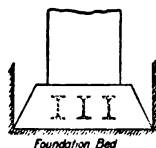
Concrete footing with or without I-beams, for heavily loaded walls, yielding foundations, or both. One or more of the beams is often imbedded in the concrete to give stiffness and absorb shock due to heavy machinery, as in power houses, etc.
